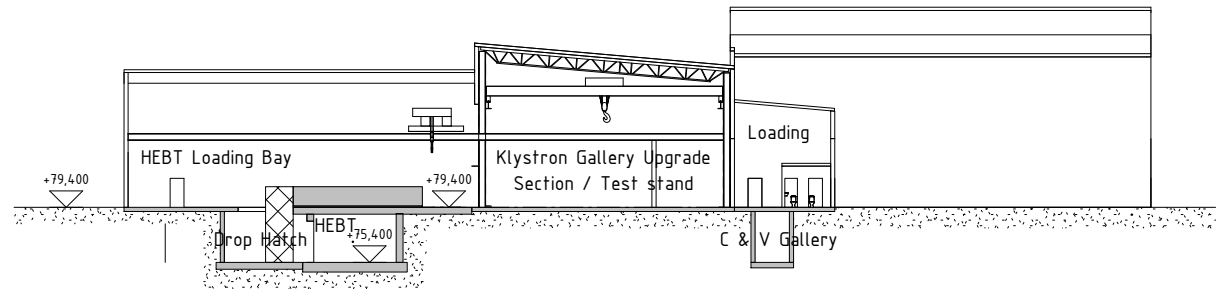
Klystron gallery assembly hall and cold box building (southwest end of tunnel).
